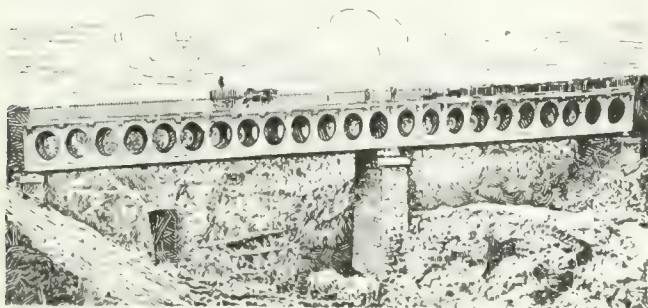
FRENCH CONTINUOUS-TRUSS CONCRETE BRIDGE
